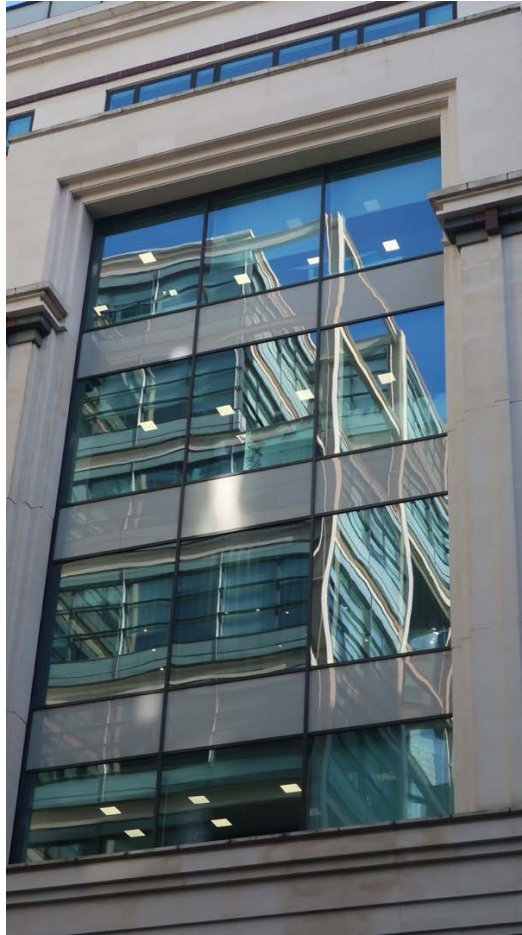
Part view of the south elevation showing the original stonework and windows.
